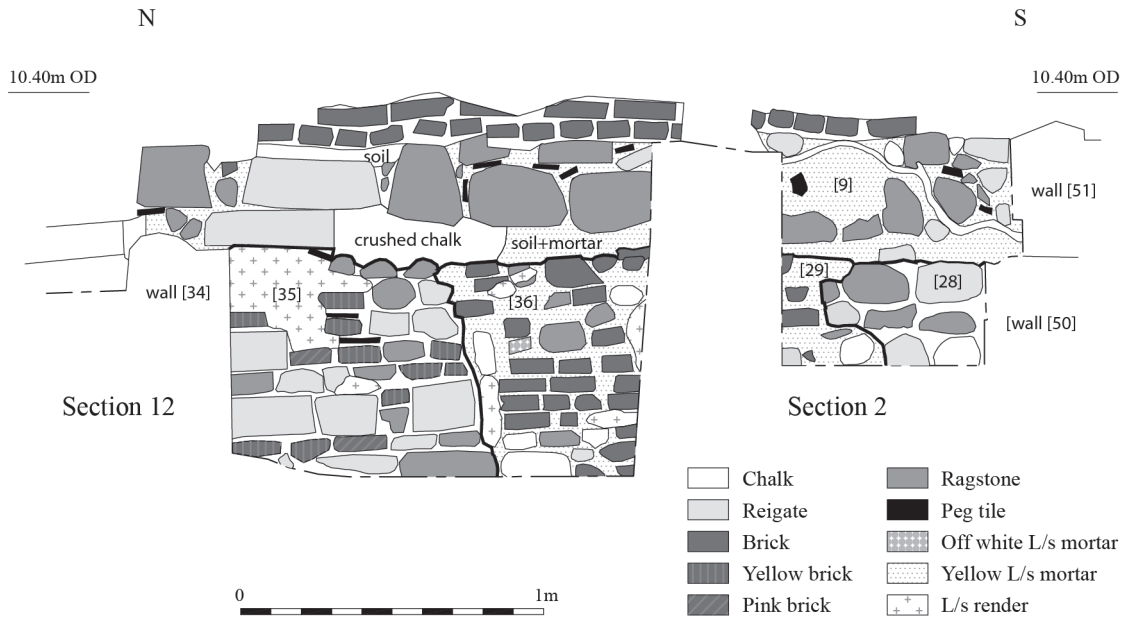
Sections 2 and 12 of blocked doorway [29]/[36] in stone cellar [28]/[35] and overlying brick wall [9] (sections located on Fig 5)
